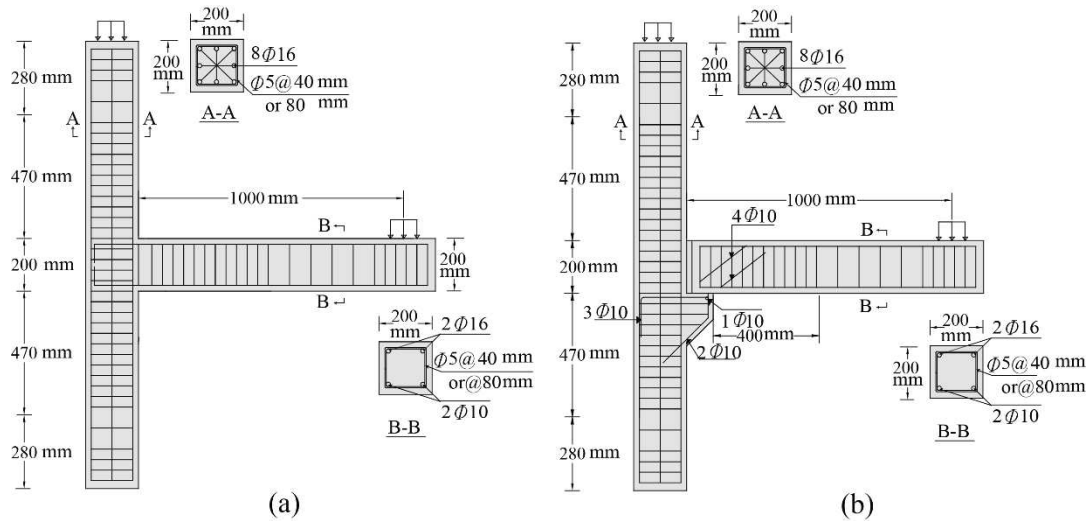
Reinforcement details of test specimens: (a) fixed (FC) and (b) pinned (PC) connections.
